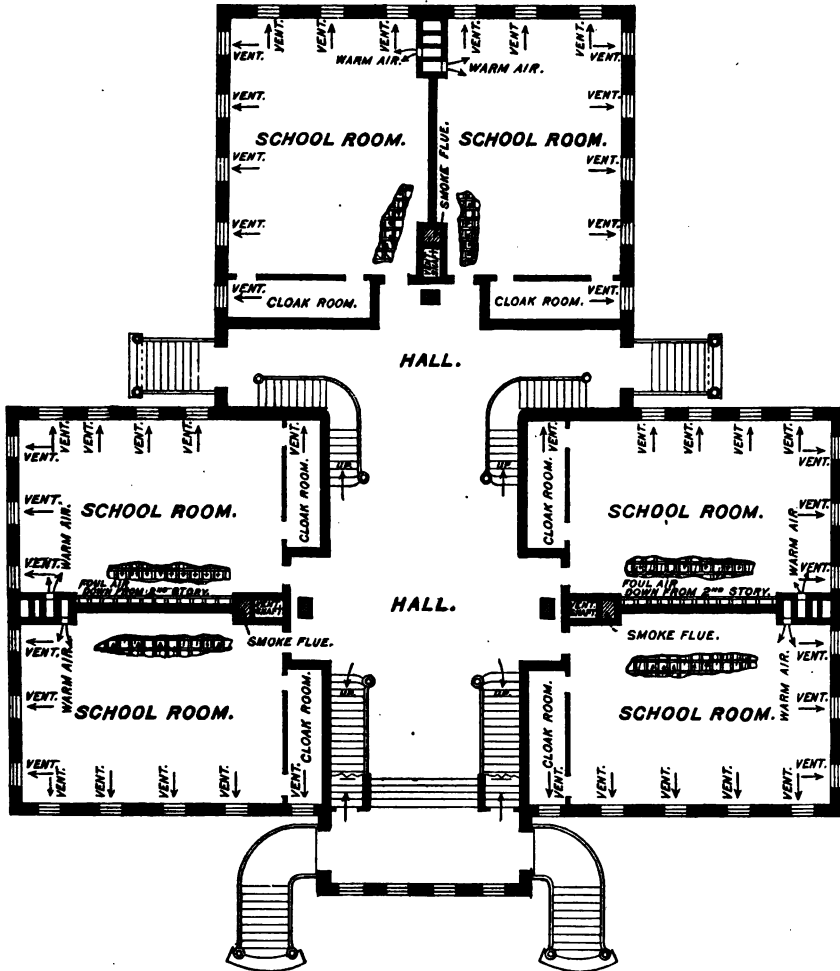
First floor plan of Segur Avenue school building, Toledo, Ohio.
